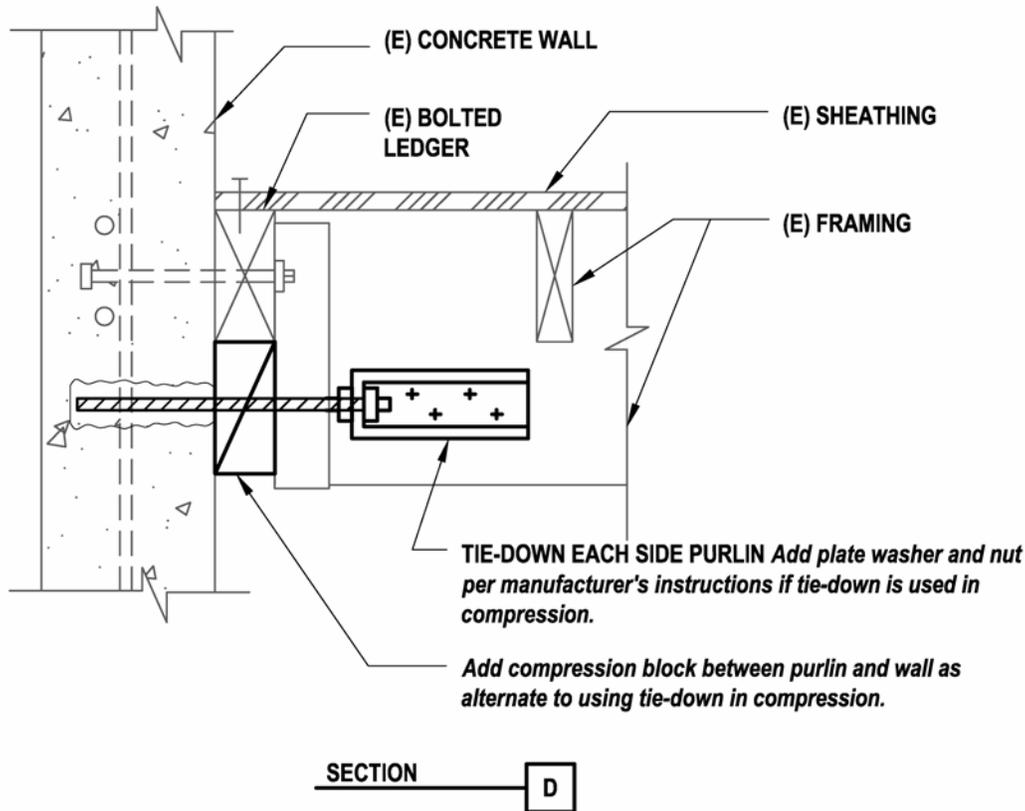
D: Wall Out-of-Plane Anchorage for Flexible Wood Diaphragm at Purlins
